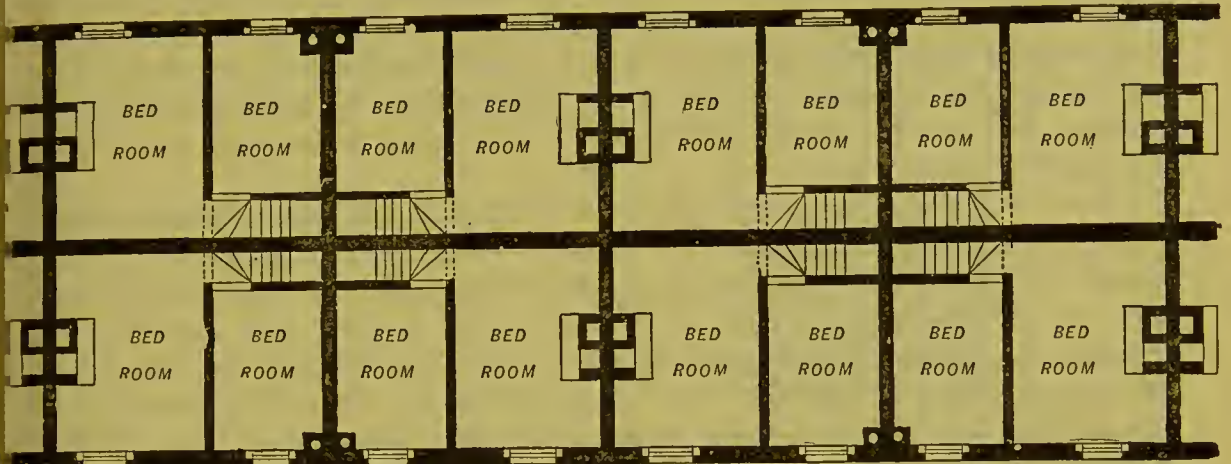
Chamber Plan (Rooms 8' 9'' high. Attic above).
